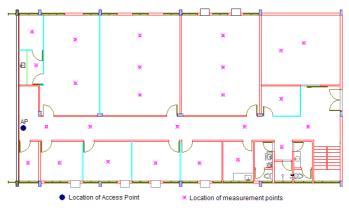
Blueprint of the ground floor with the location of access point (AP) and the measurement points.
